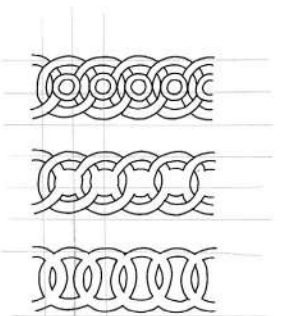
Deductive analysis of existing facade details, based on original drawing of the South East Elevation.
